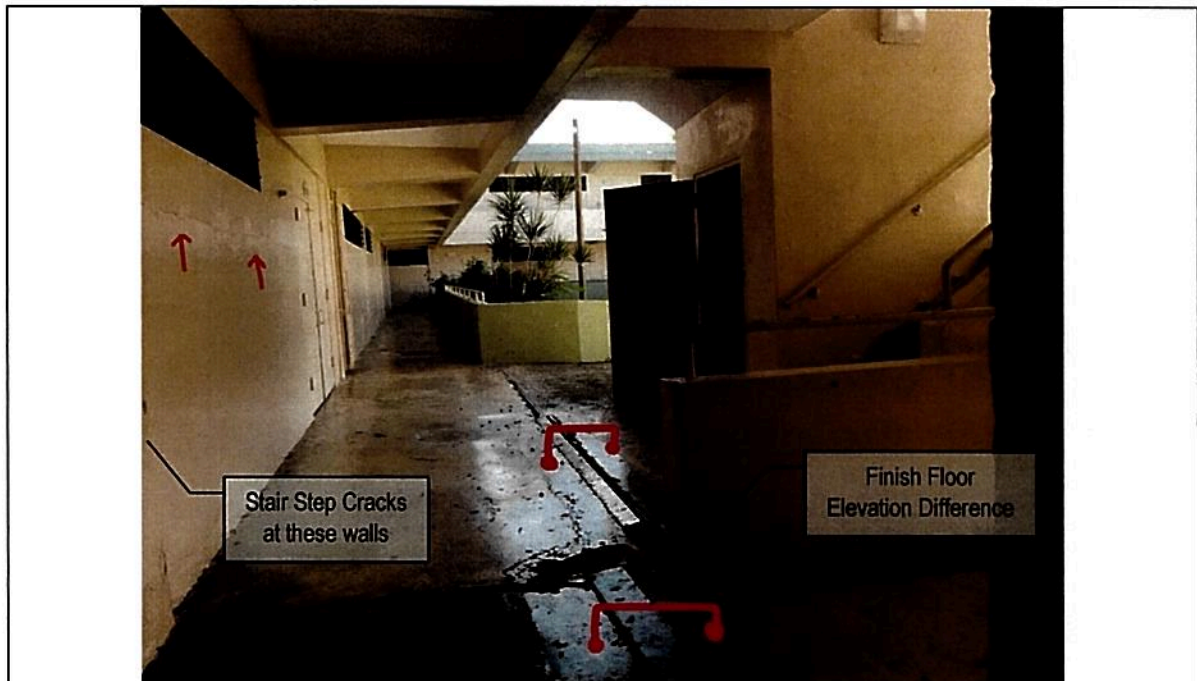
Differential settlement condition at the SE Stairs area noticeable at the building expansion joint (opening), adjacent CMU walls cracking, floor elevation difference and ceiling separations and cracks at the stairs and building joint.
